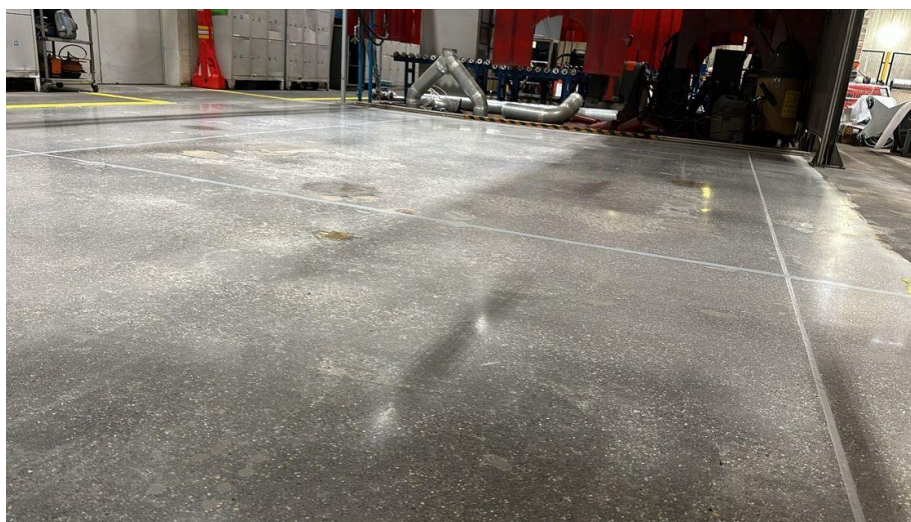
Concrete industrial floor (Example 1) after repair: general view and visible reconstructed and completed shrinkage expansion joints [38]
